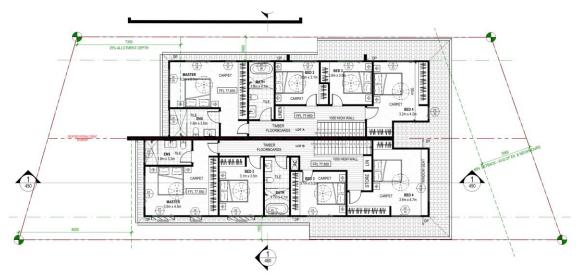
Proposed First Floor Level - 34 Frenchmans Road
